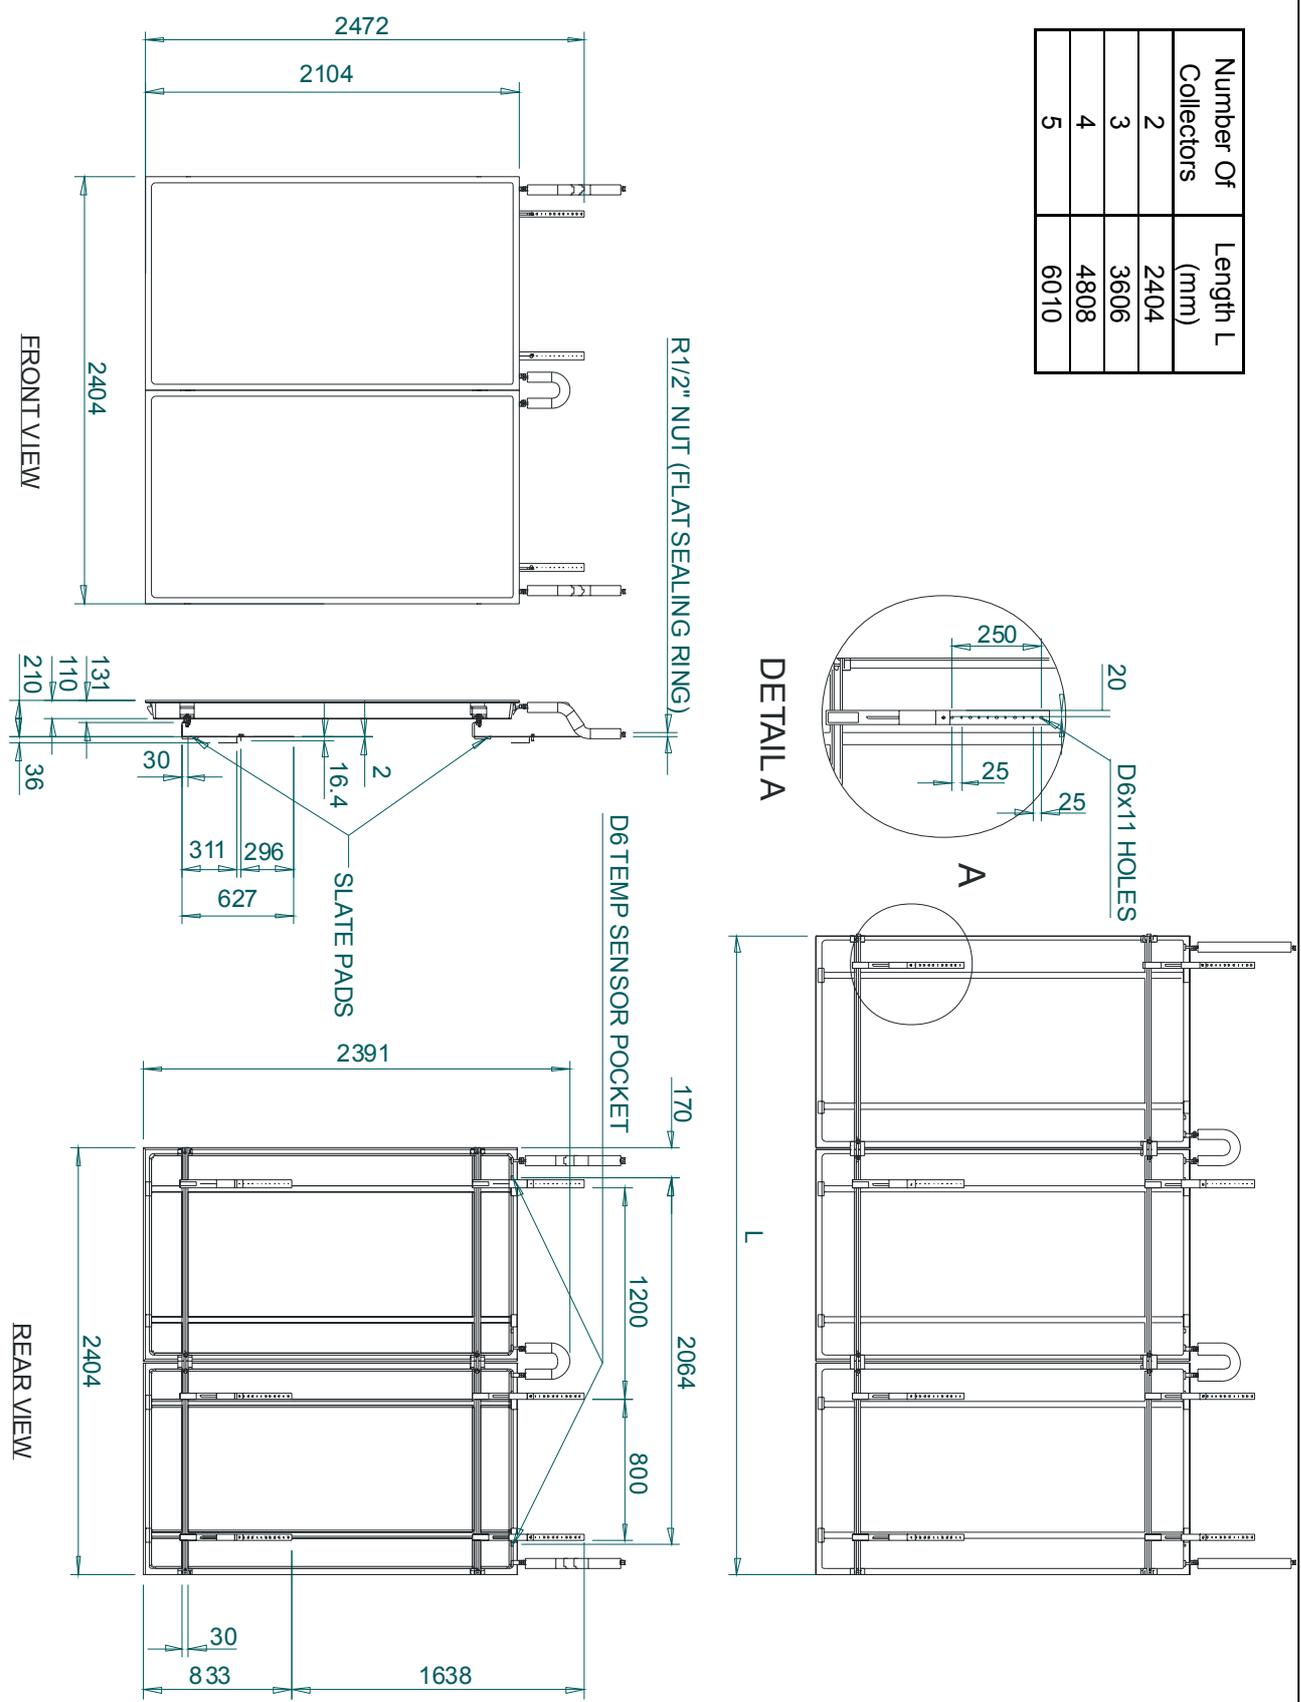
Dimensions Of On Roof Vertical Collector Assembly (HHL P/No's 64300011 To 564300014)
